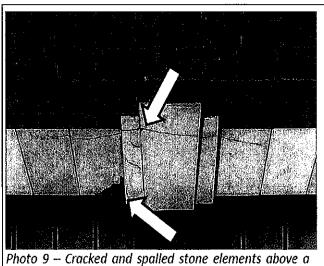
Cracked and spalled stone elements above of third-floor window head
